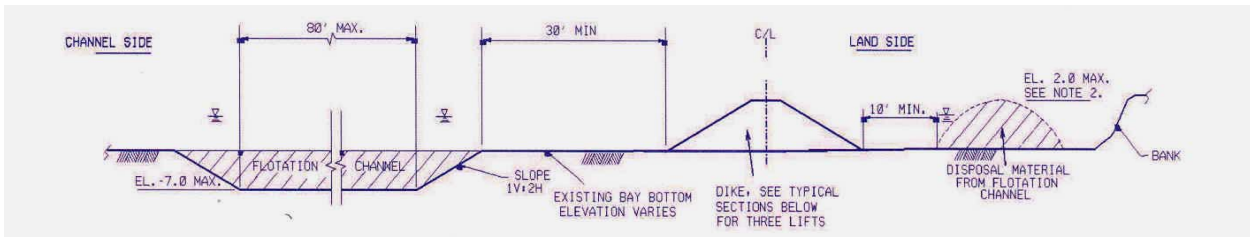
Typical dike section for second construction lift on MRGO (USACE 2004)
